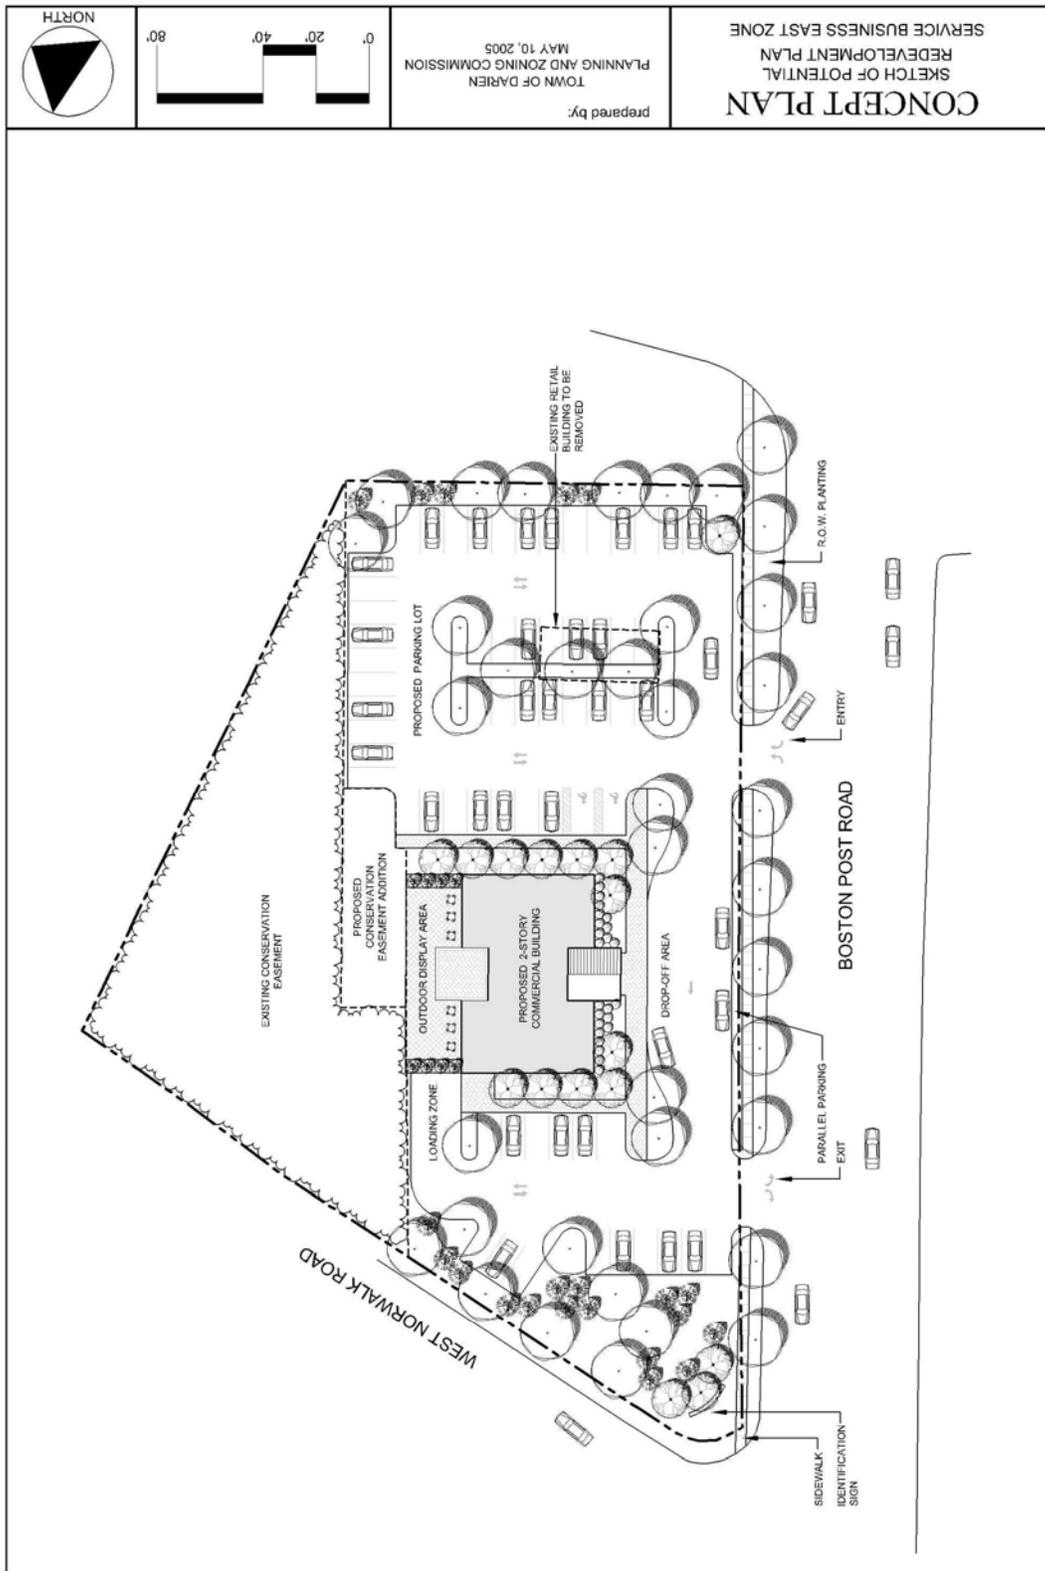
CONCEPT PLAN: NOROTON
